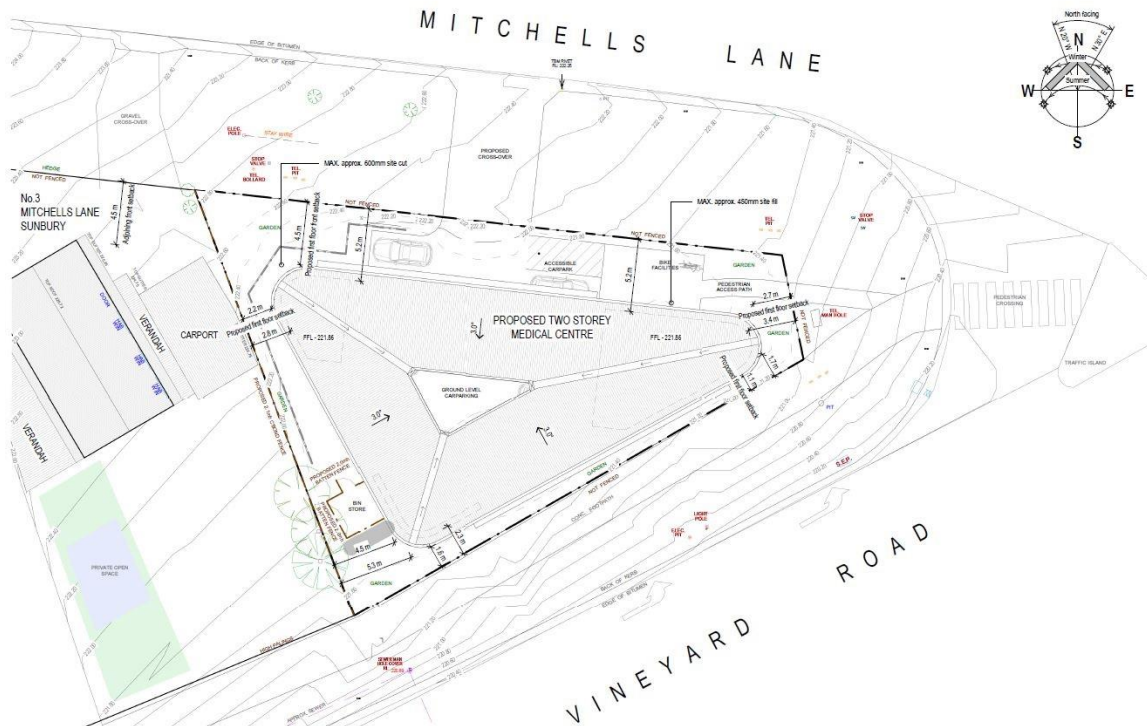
Proposed Site Plan (Sheet TP03 LEEMONdesign) – 1 Mitchells Lane, Sunbury
